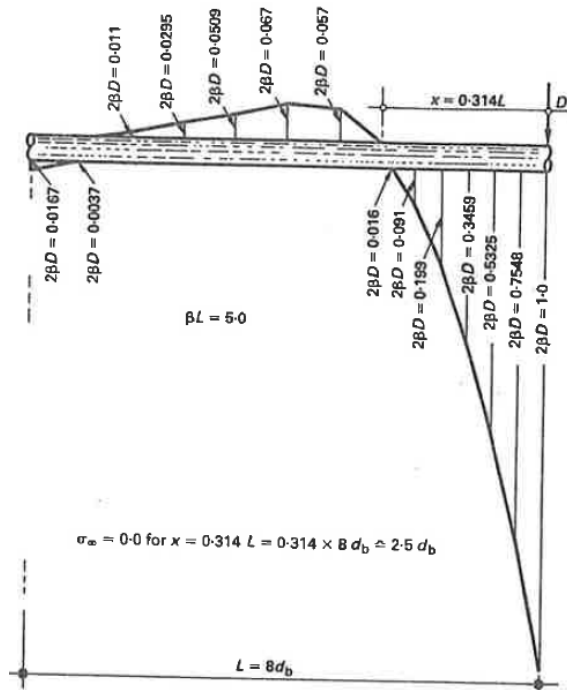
Diagram of concrete stresses under a dowel, due to a dowel force  $D$  acting on the concrete face [35b]
